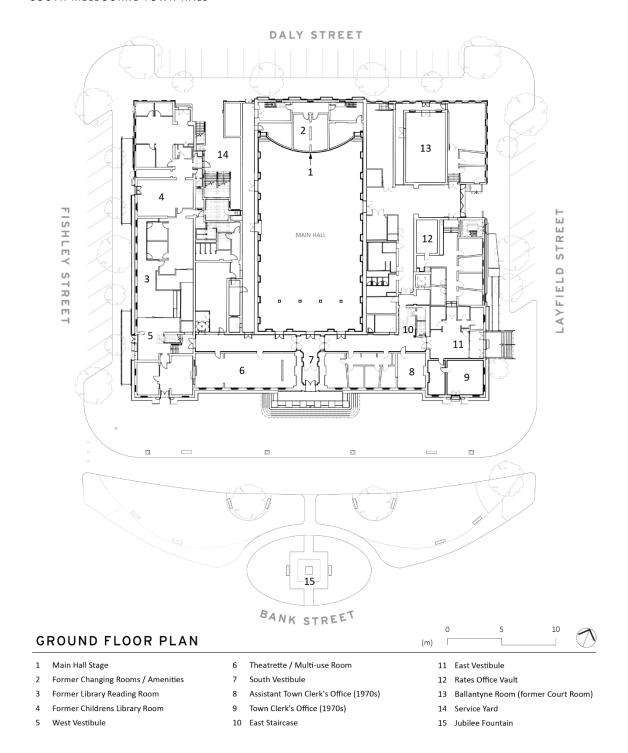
South Melbourne Town Hall, ground floor plan: with key spaces/areas identified
